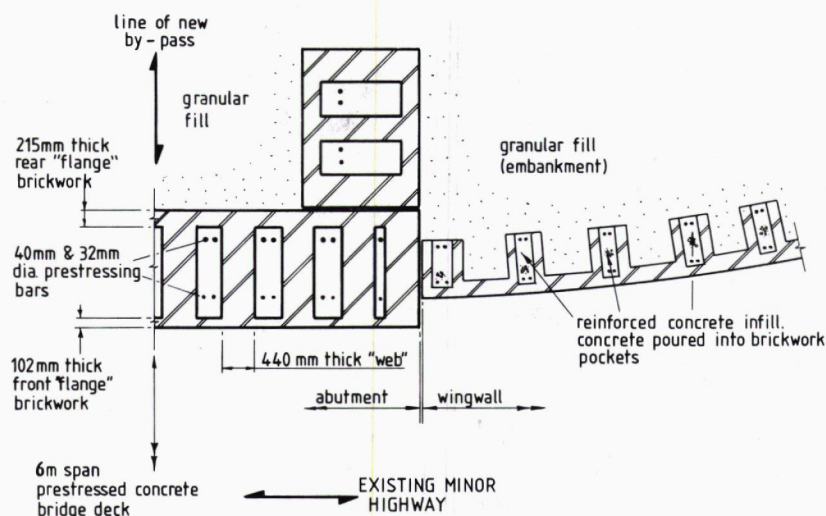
Foxcovert Road Bridge: horizontal section through end support showing prestressed brickwork diaphragm wall abutment and reinforced pocket-type wingwall.
